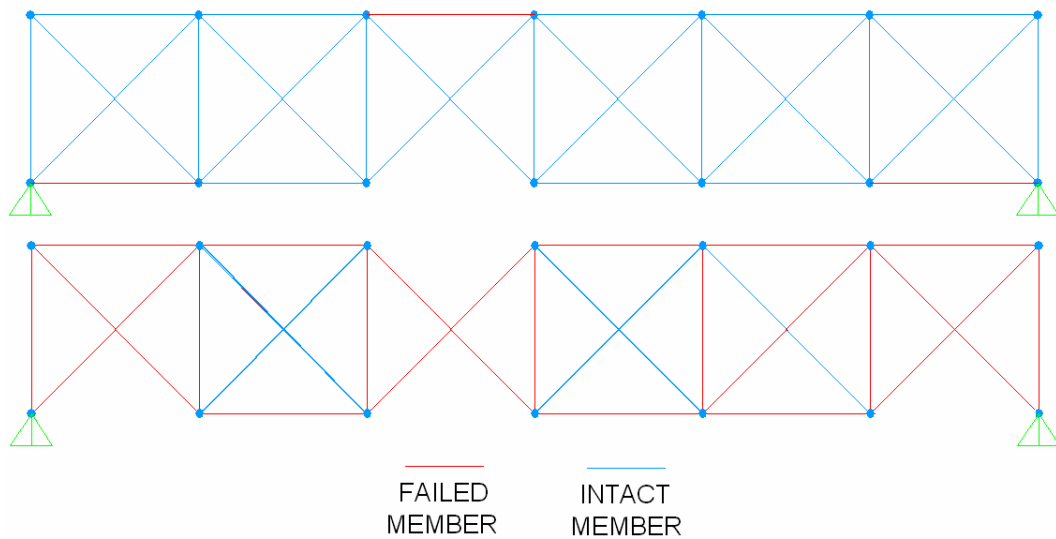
Redundant Truss Showing Progressive Failures Upon Magnified Member Removal
